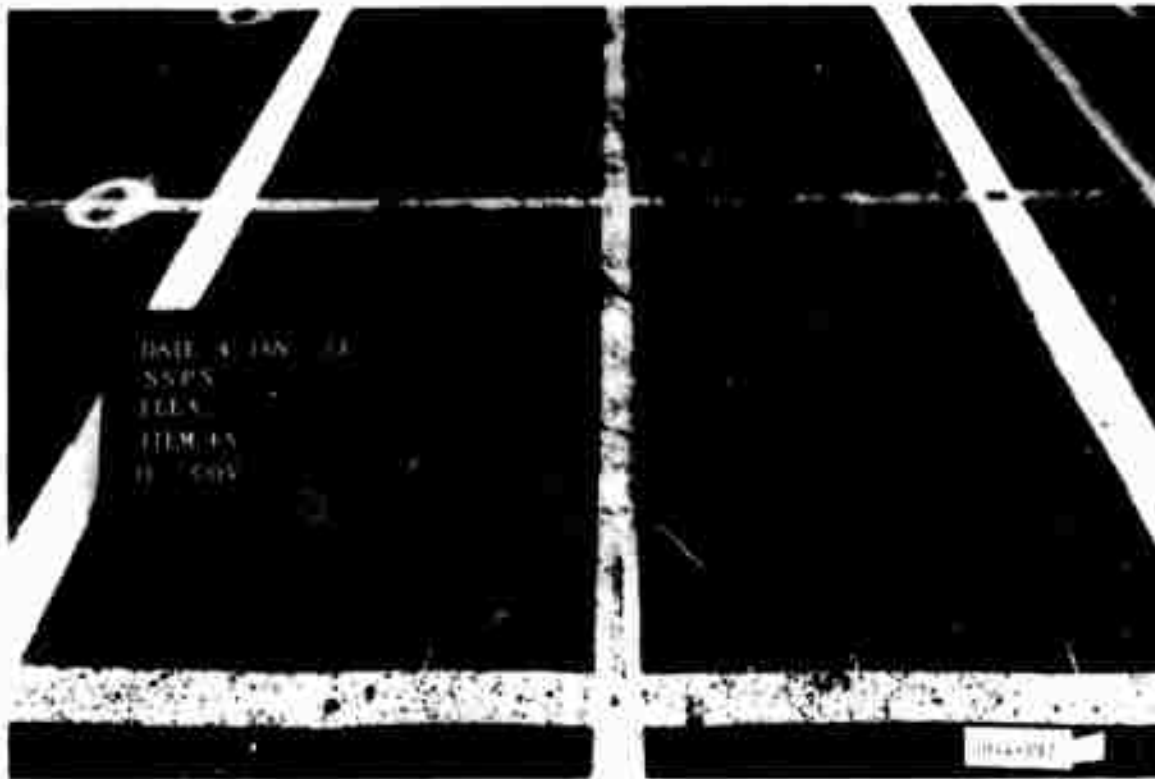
Subitem 4a, lane 3, flexible pavement test section, prior to traffic
